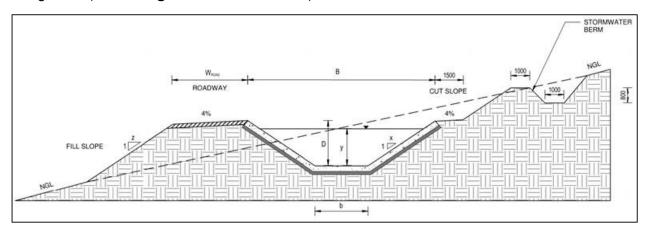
Trapezoidal canal cross-section (Types T1, T2 and T3)
